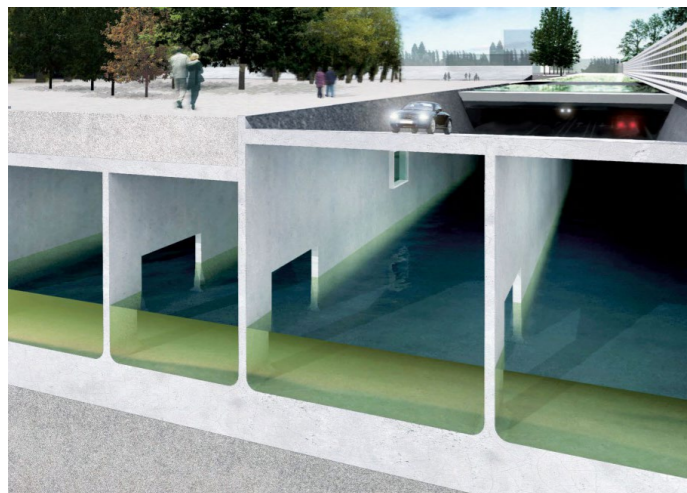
Underground storage (Gemeente Rotterdam, n.d.)
